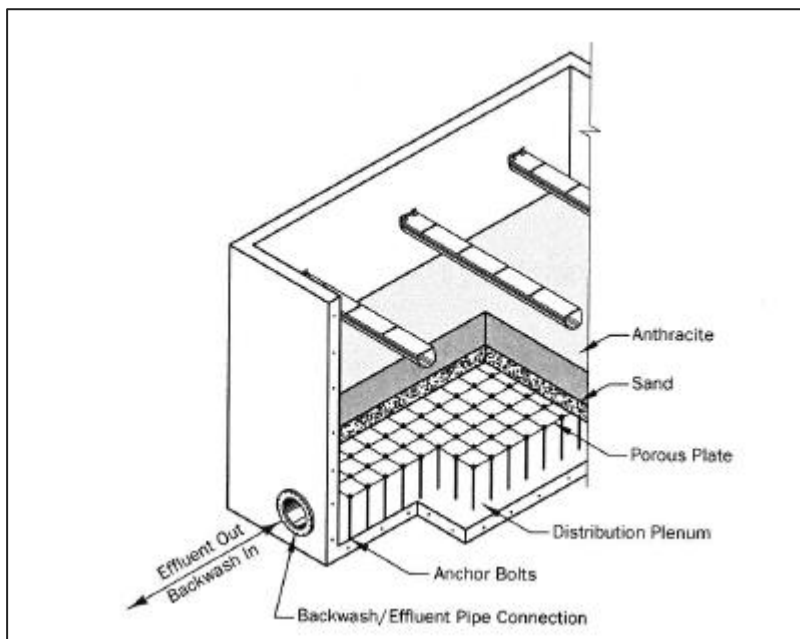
Typical Porous Plate Underdrain (Beverly, 2011)
